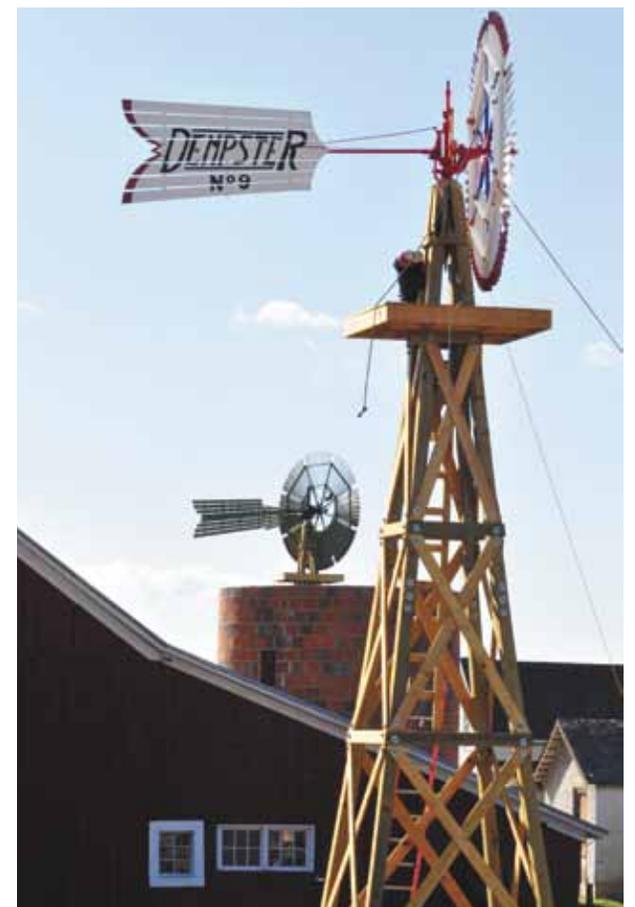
foot Dempster windmill is about to go up at 17 Mile House Farm Park.
